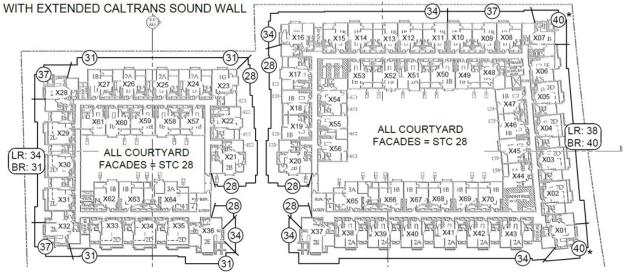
Minimum Recommended STC Ratings for Windows and Exterior Doors for the Third through Fifth Floors, With the Proposed Sound Wall Extension
